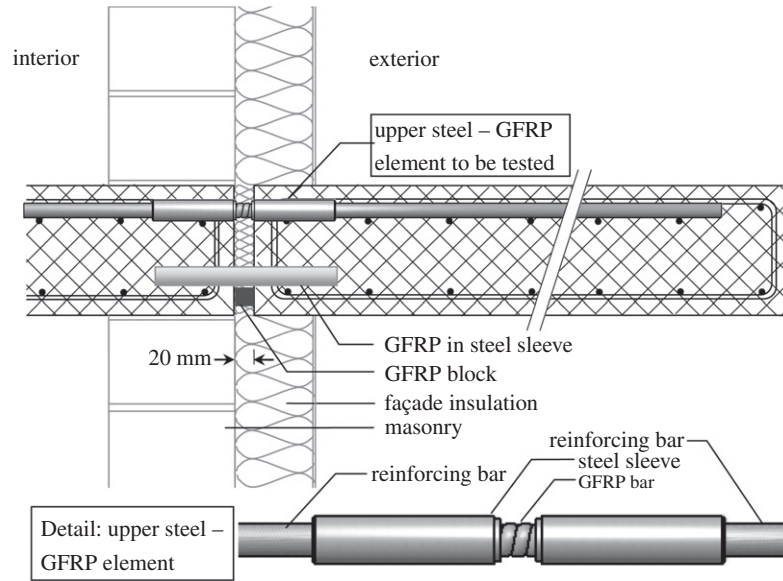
Load-transferring insulation section with horizontal steel-GFRP elements.
